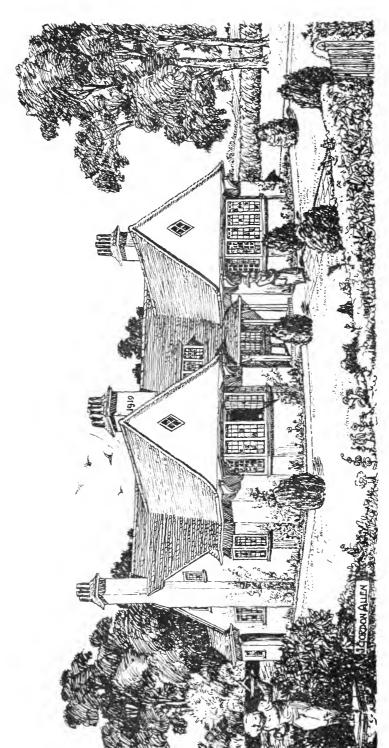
This bungalow—if it may be so called, there being considerable accommodation on the first floor in the roof—was built in Wales and Sussex in 1911. at a cost of £650 to £700. The plans are shown and described on the opposite page. All exterior walls are of brick and roughcast, with a tarred plinth to prevent drup from rising up the walls, and the roof and chimney tops are tiled. Most of the windows have leaded-light casements with irom frames,
